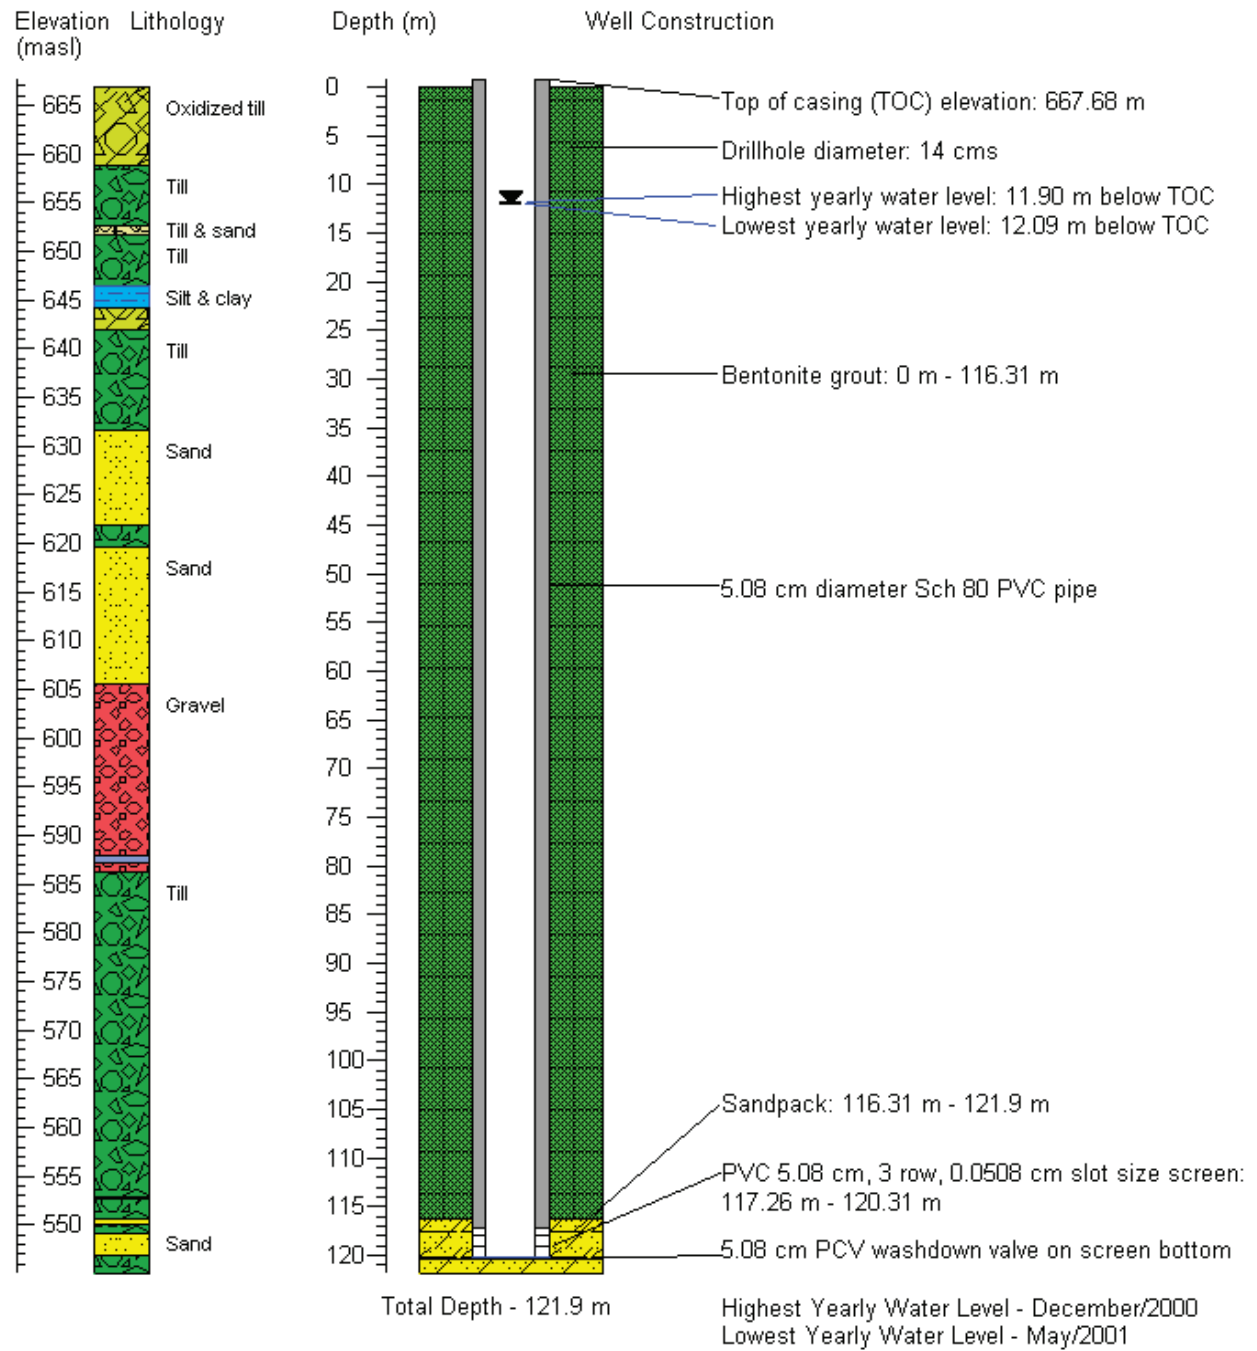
Piezometer construction details: WEPA 00-1-120
